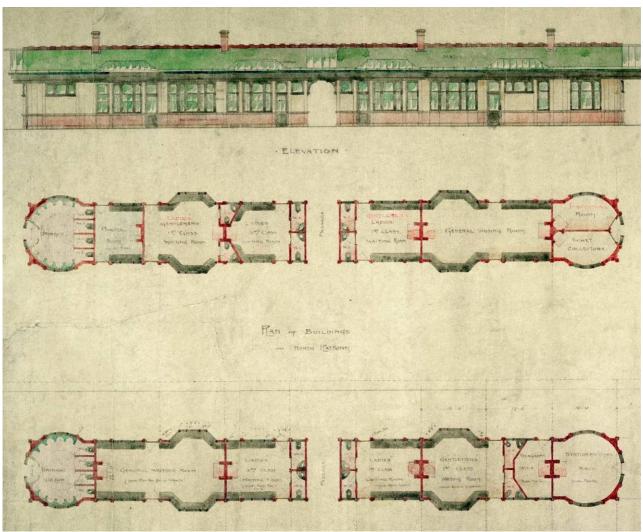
c.1896 plans and elevations of the proposed platform buildings.⁶⁵
